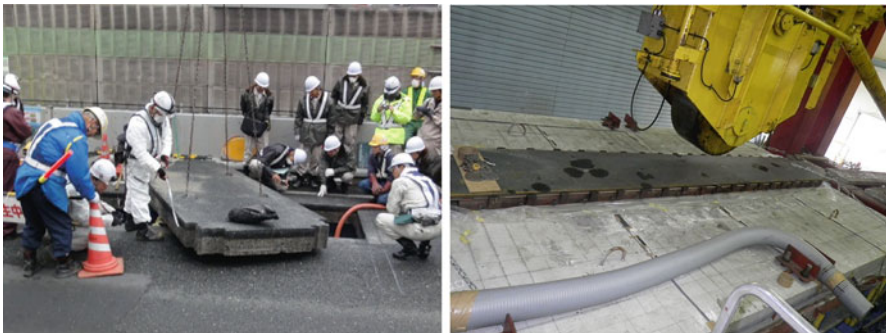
Cutting out a steel plate-bonded RC slab sample (left) and carrying out moving-wheel loading test (right)
